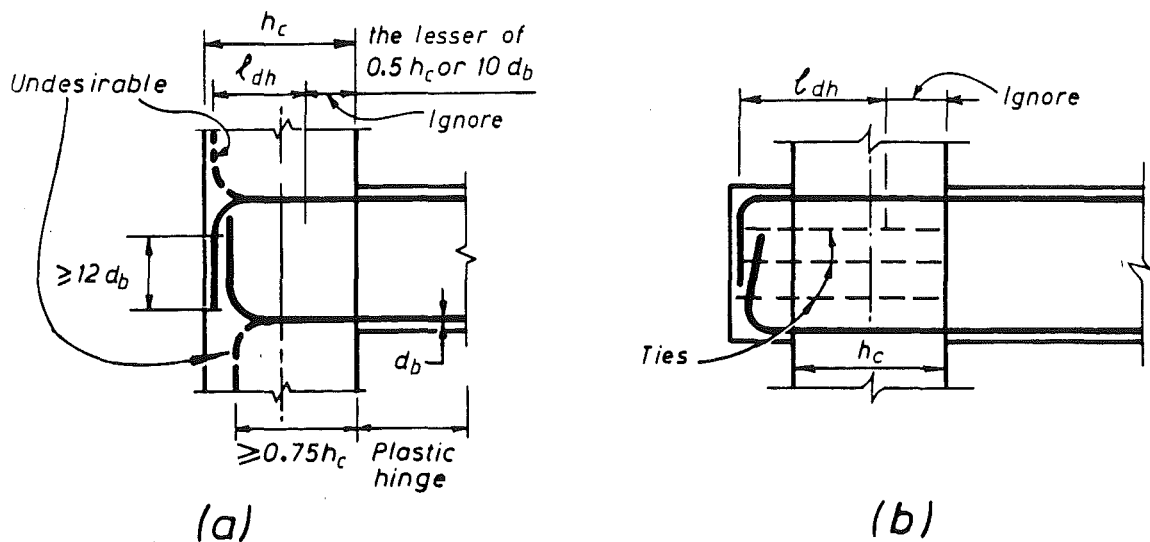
Detailing requirements for longitudinal beam bars in exterior beam-column joints [4]
